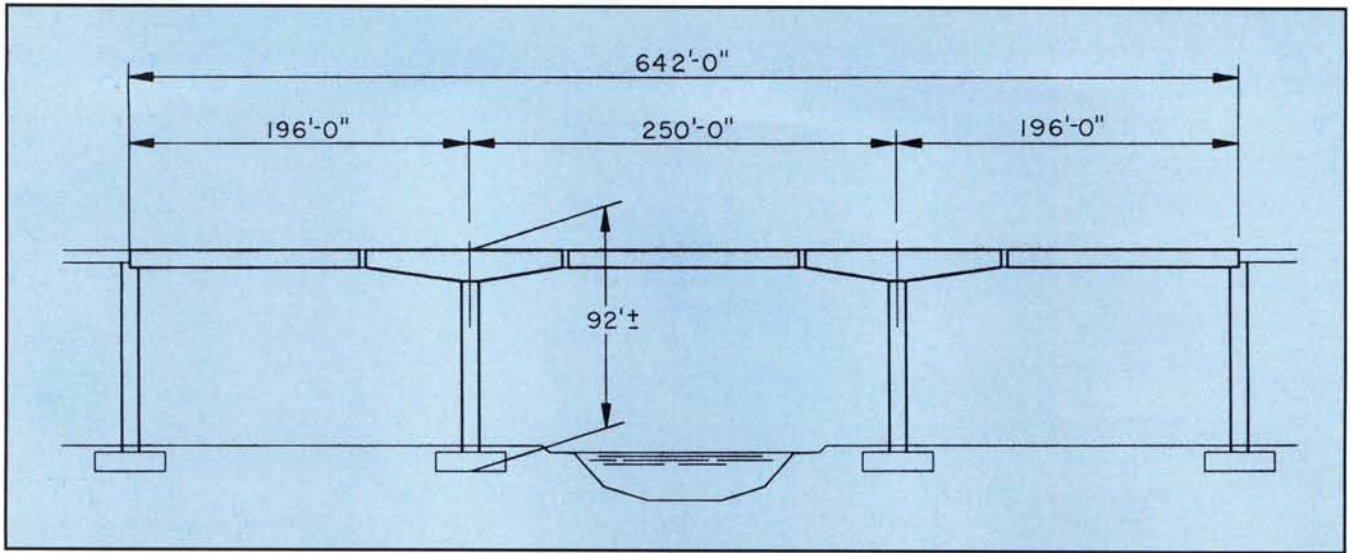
Simplified elevation of three-span central section showing 250 ft (76.2 m) main span and total height of structure.
